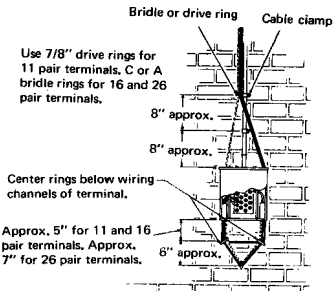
Building Mounted Cable Terminal (Top Entrance)
